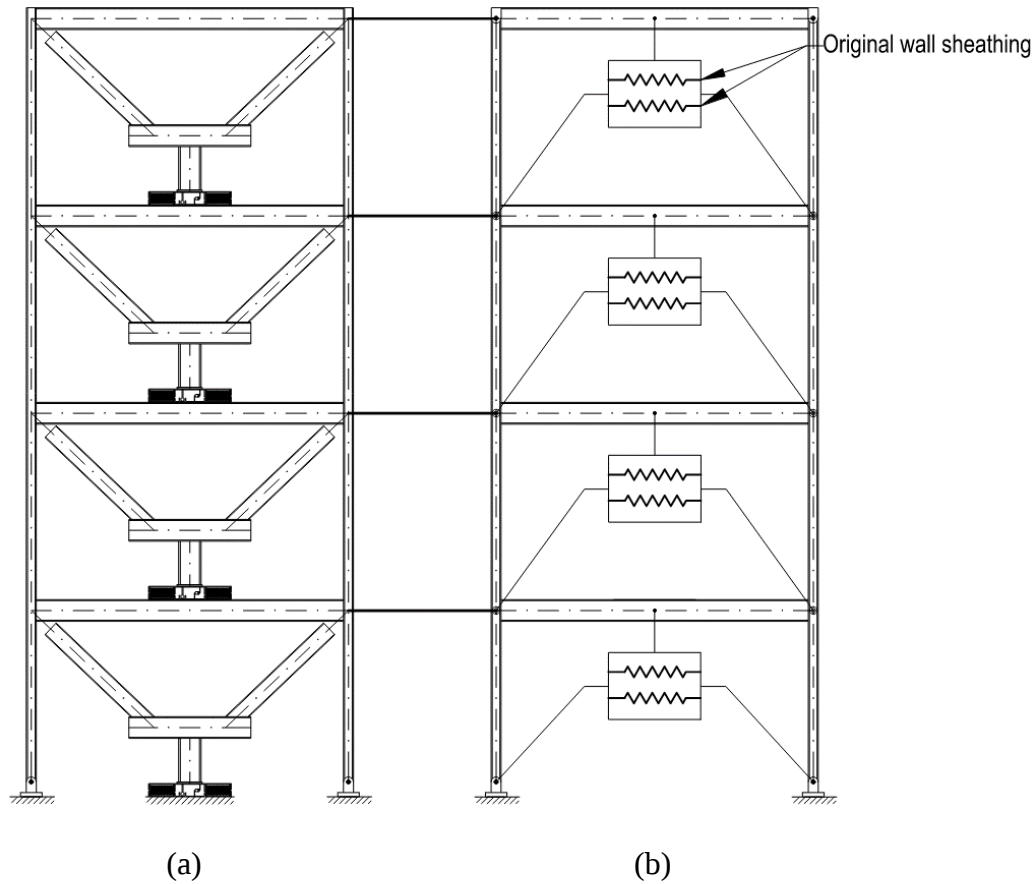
Elevation view of the original unretrofitted wood framed building retrofitted on all stories with the Y-SCVD-EBF module: (a) Y-SCVD-EBF steel retrofitting module; (b) Original unretrofitted timber structure
